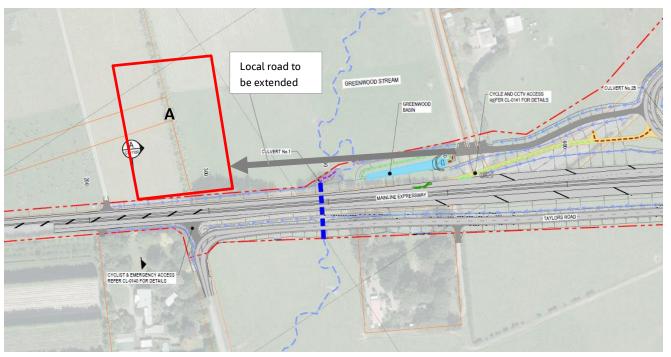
Likely access to Site A. Image sourced from PP20 Full Alignment Design, General Arrangement Layout Plans dated 10 Oct 2018, Drawing No. PP20-DR-GN-1061 URL: <a href="https://www.nzta.govt.nz/assets/projects/peka-peka-to-Ōtaki-expressway/PP20-full-alignment-design.pdf">https://www.nzta.govt.nz/assets/projects/peka-peka-to-Ōtaki-expressway/PP20-full-alignment-design.pdf</a>
